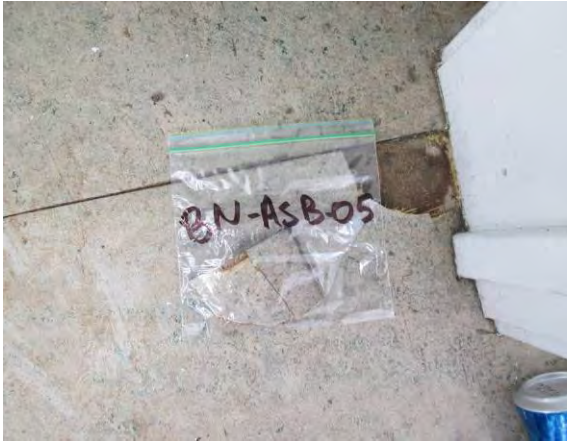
View of beige rolled flooring sample BN-ASB-05.
